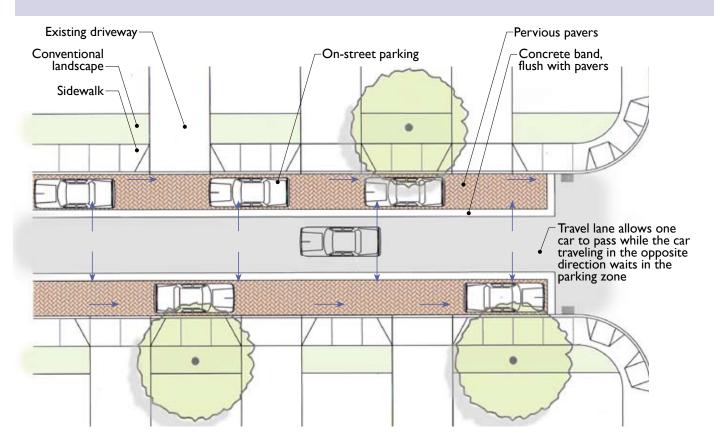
Pervious Paving in Parking Zone-Plan View
